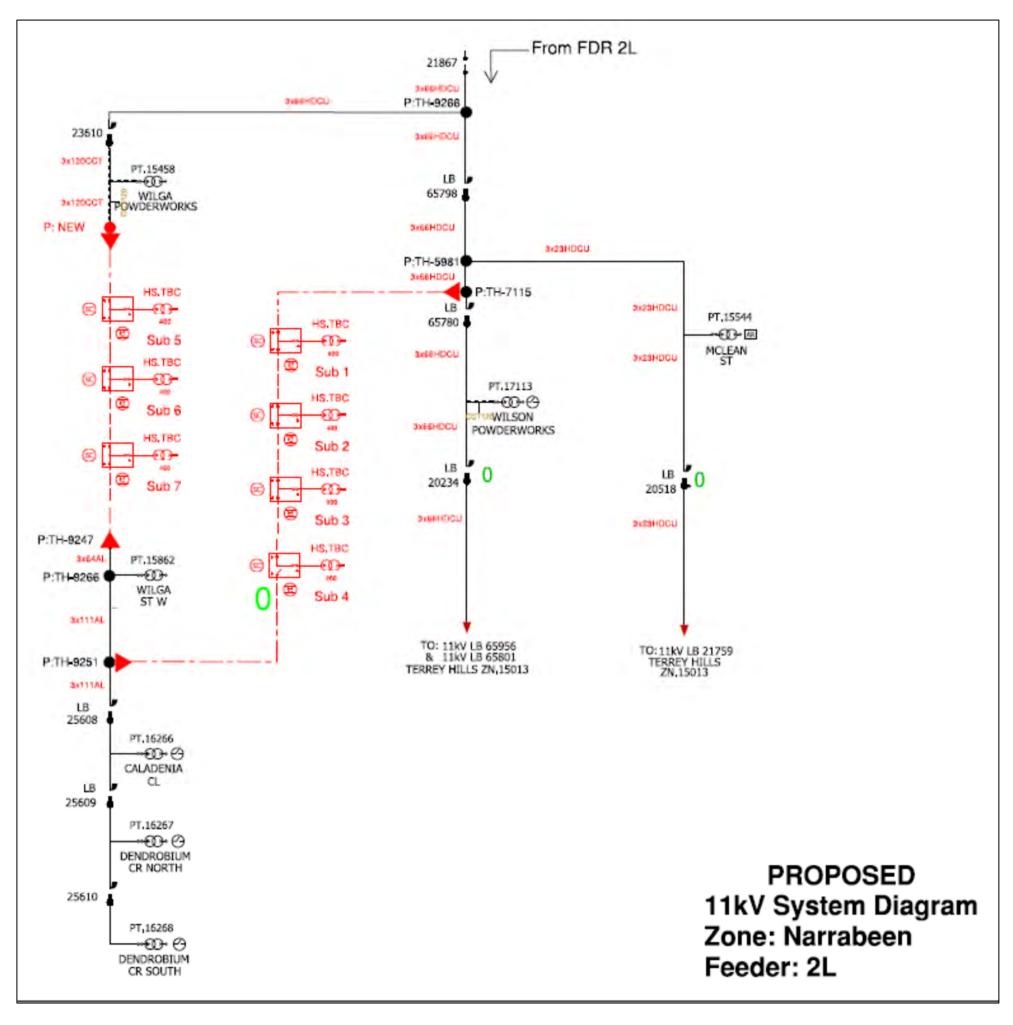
Proposed Subdivision System Diagram Narrabeen PA2L
